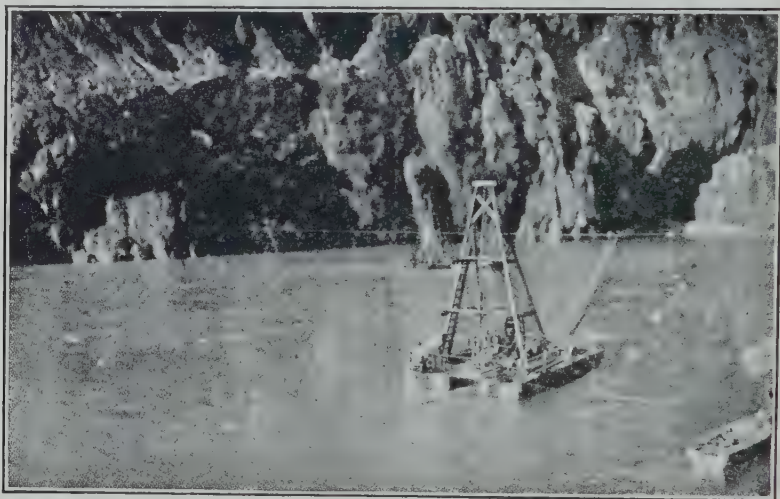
Diamond drill outfit in use on Colorado River. (Courtesy of Sullivan Machine Company.)
